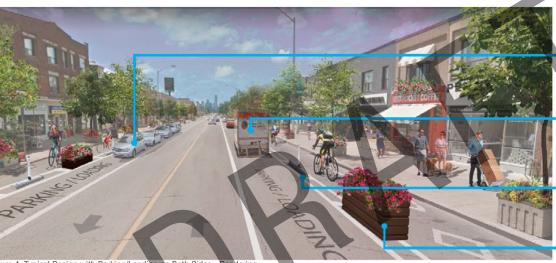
Typical Design with Parking/Loading on Both Sides -Rendering
